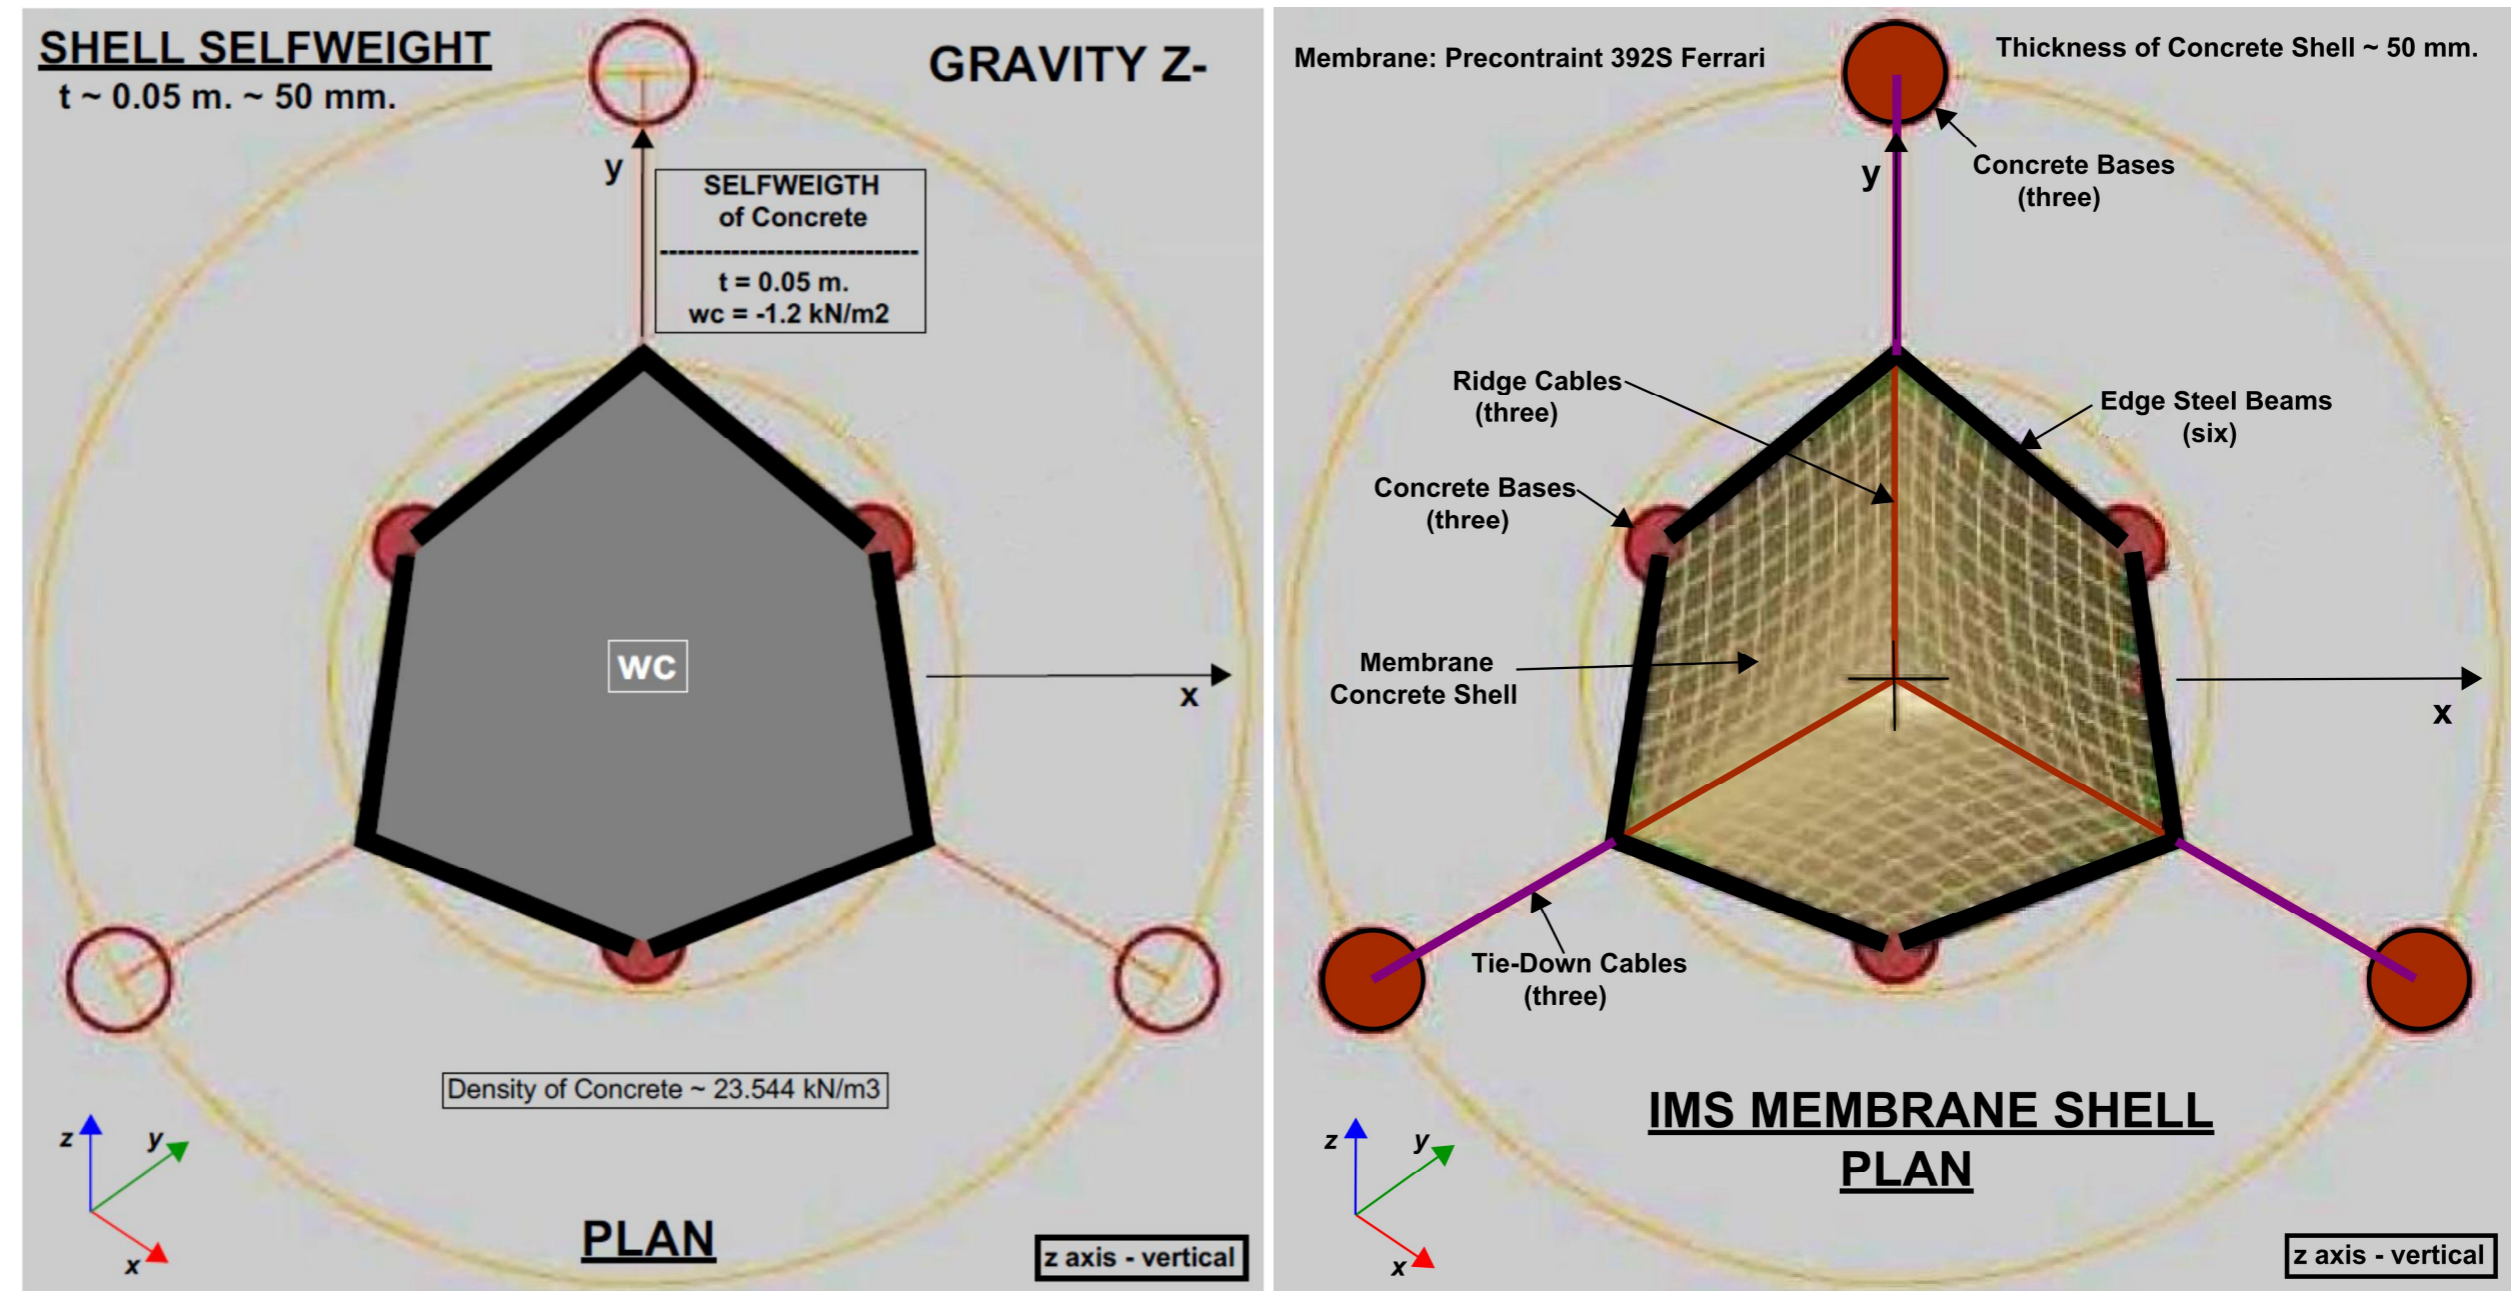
Step 5 – 3D Prototype structure Selfweight Load condition and Membrane Concrete Shell structural components.
